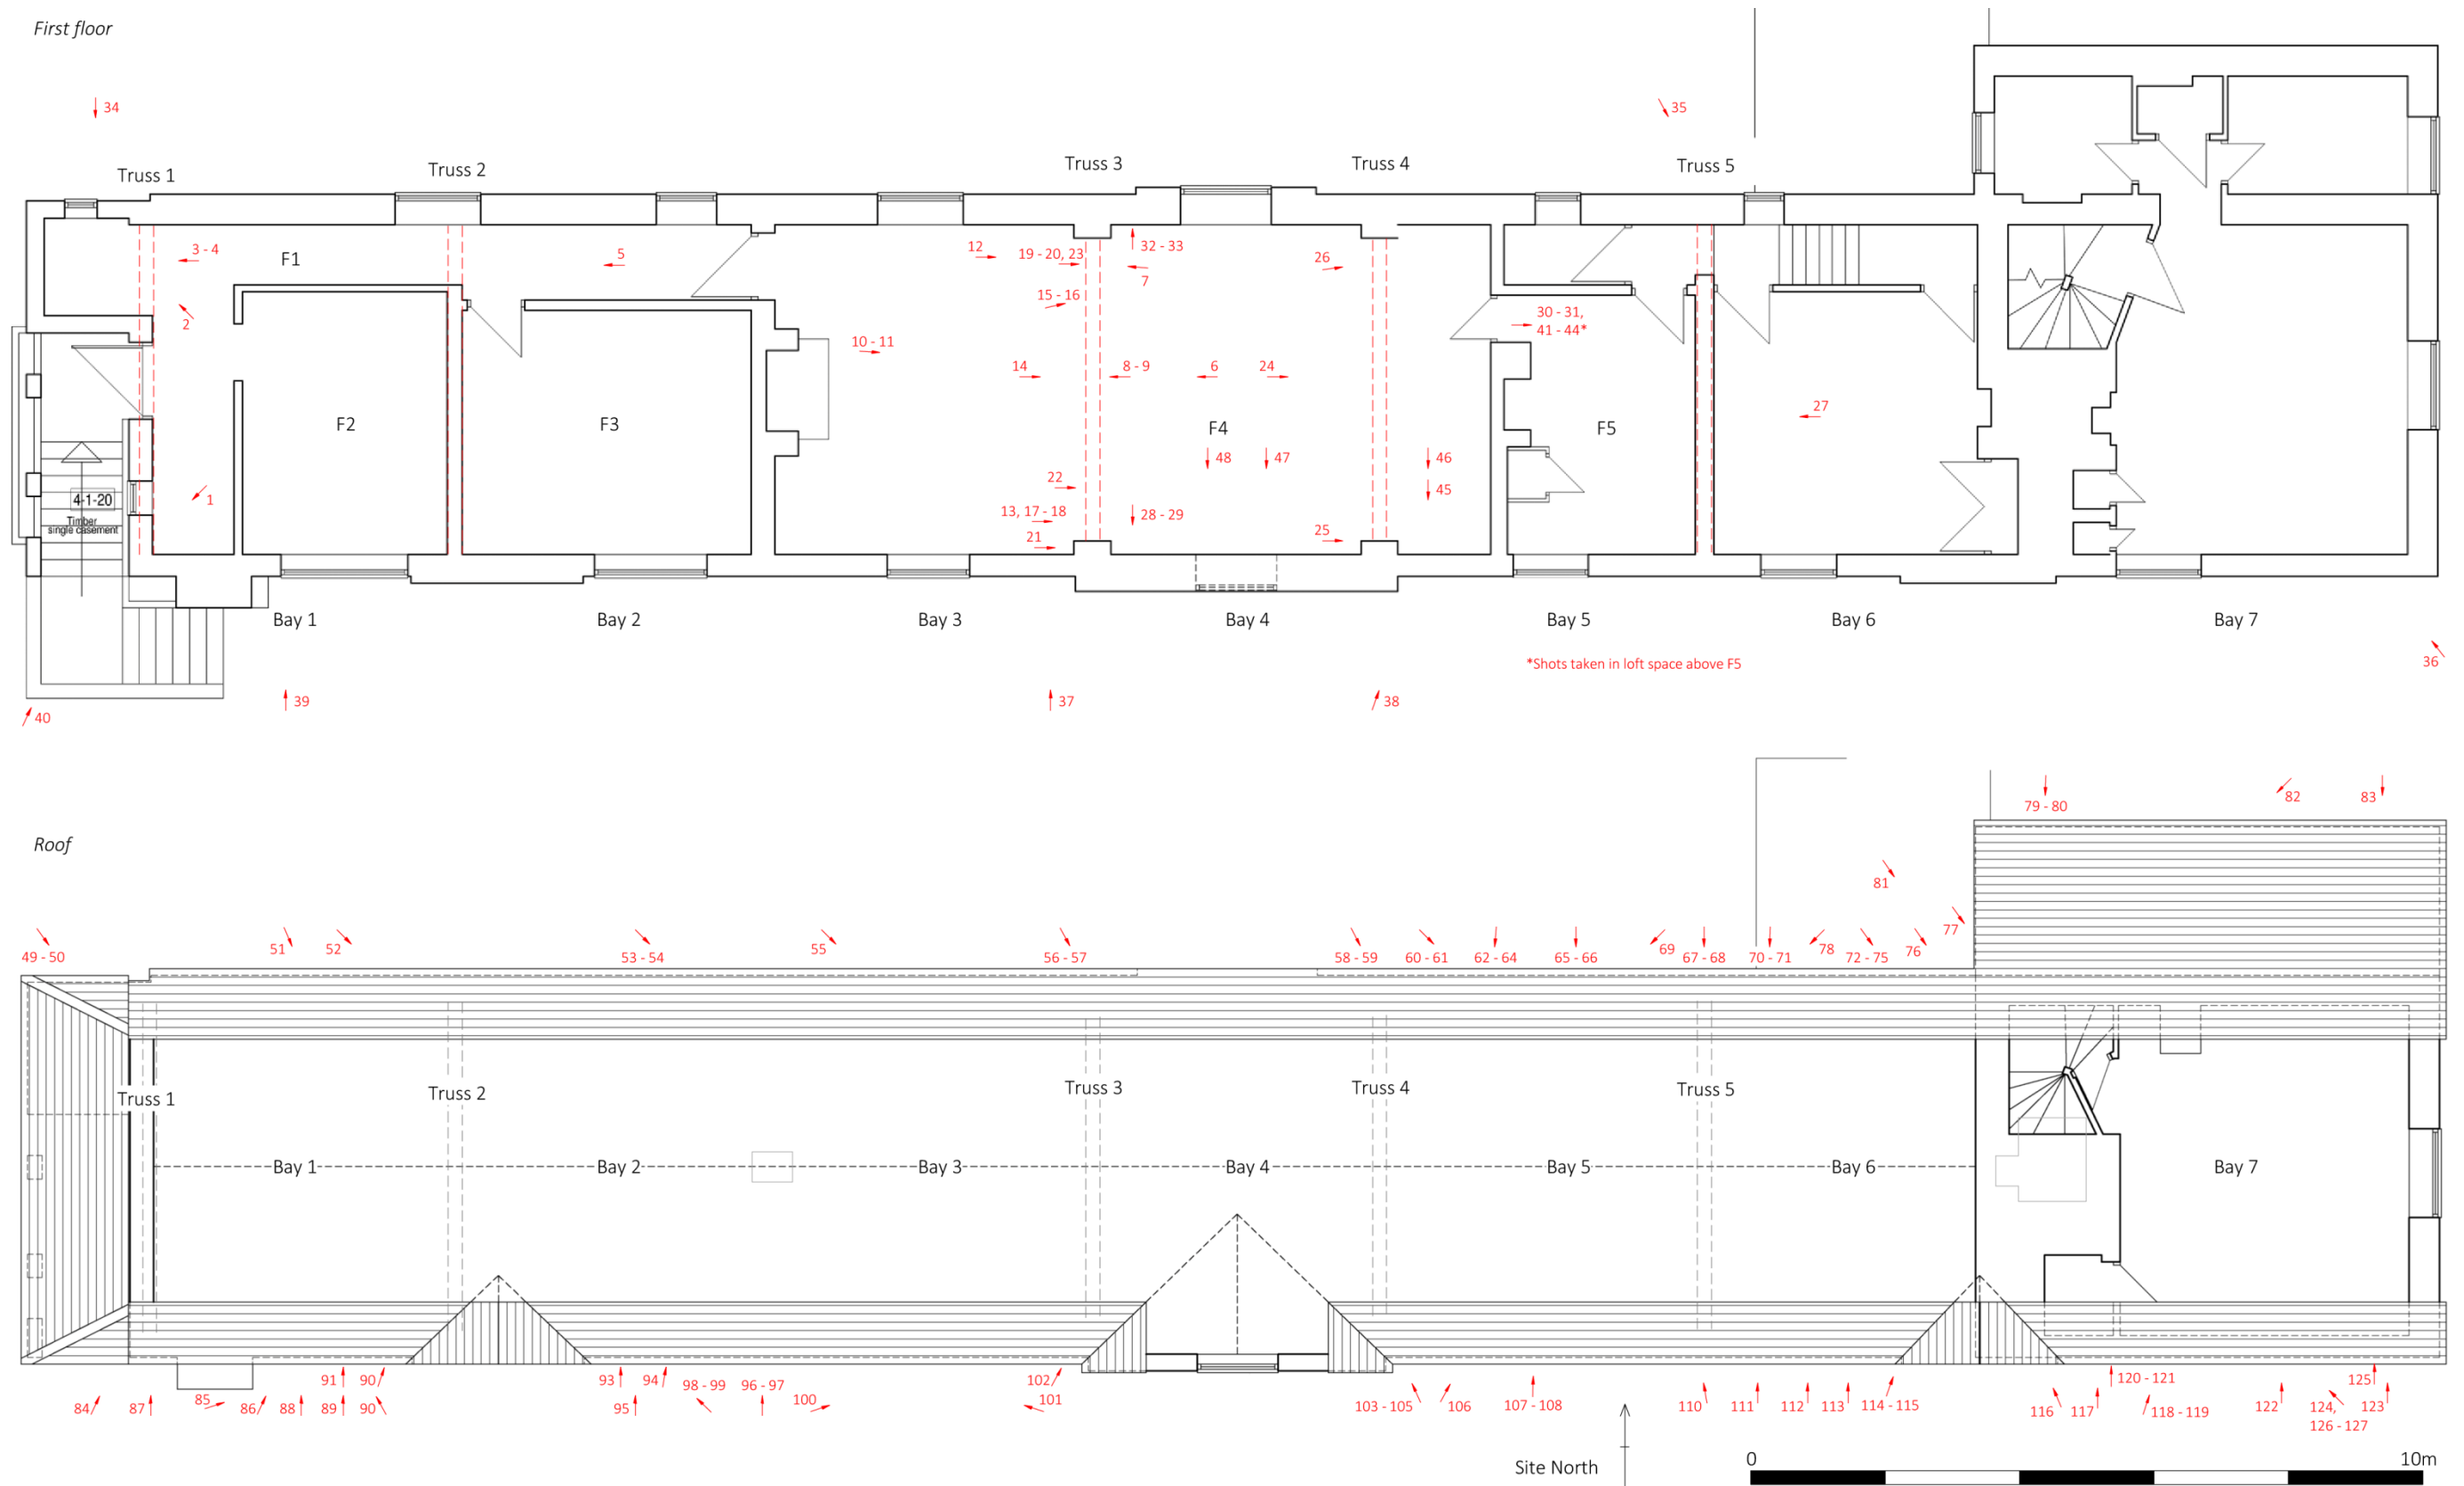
Photo plans (scale 1:100) N.B. shot numbers correspond to Photograph List in Appendix 1
